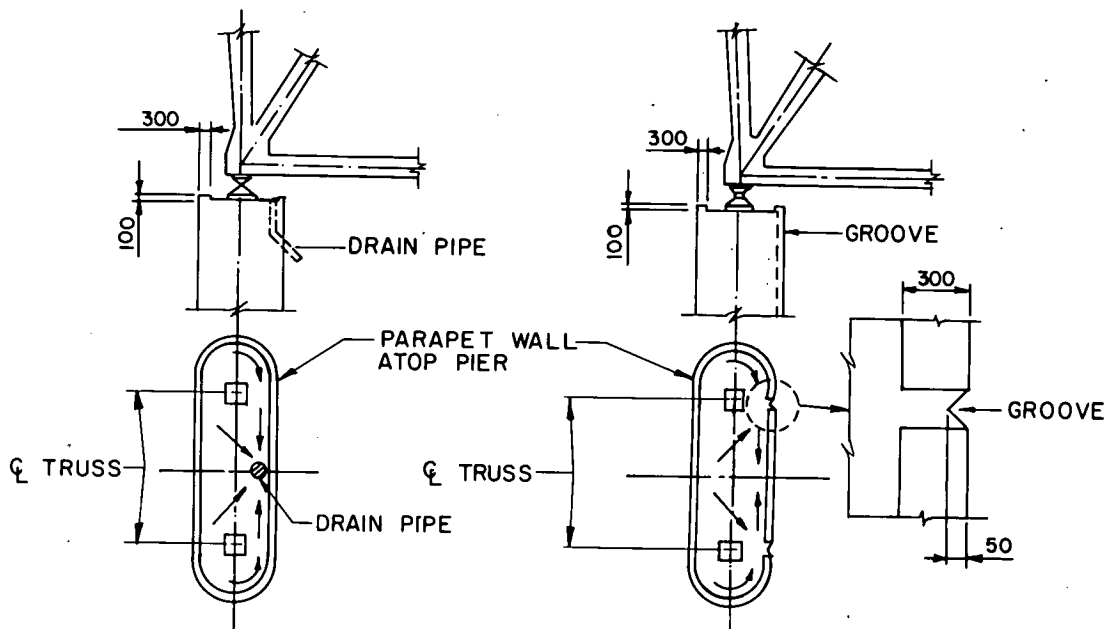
Parapet wall on top of pier with sloped cap and drainage—Ohkawa Railroad Bridge. [Yamada 1983]
